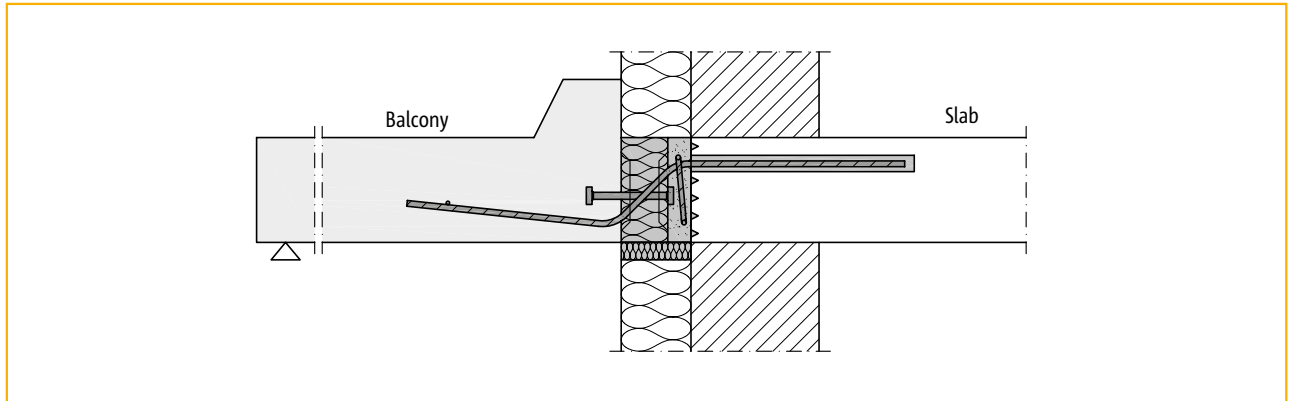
Connection of a prefabricated balcony on an existing floor using type RQP
